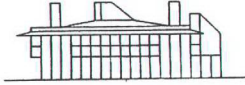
Uşaklıgil House –elevation. Source: Eldem (1982).
